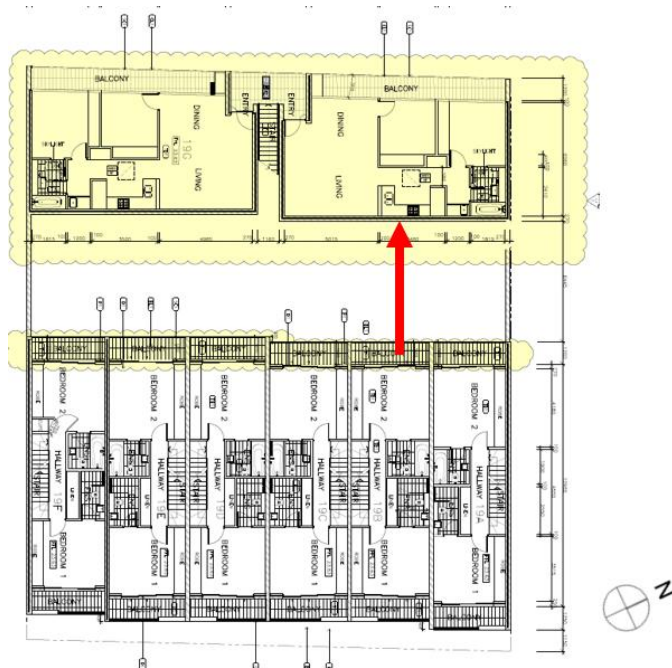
approved floor plans for dwellings at 19 William Street showing balconies facing blank walls opposite
